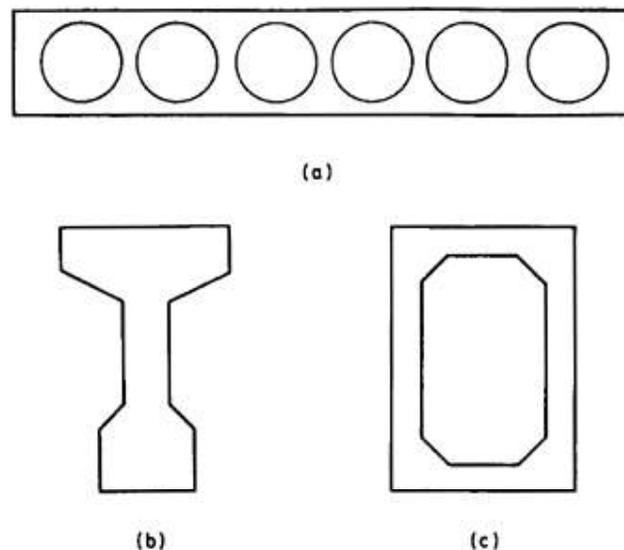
Sections: (a) hollow-core slab; (b) I-section; (c) box-section.
